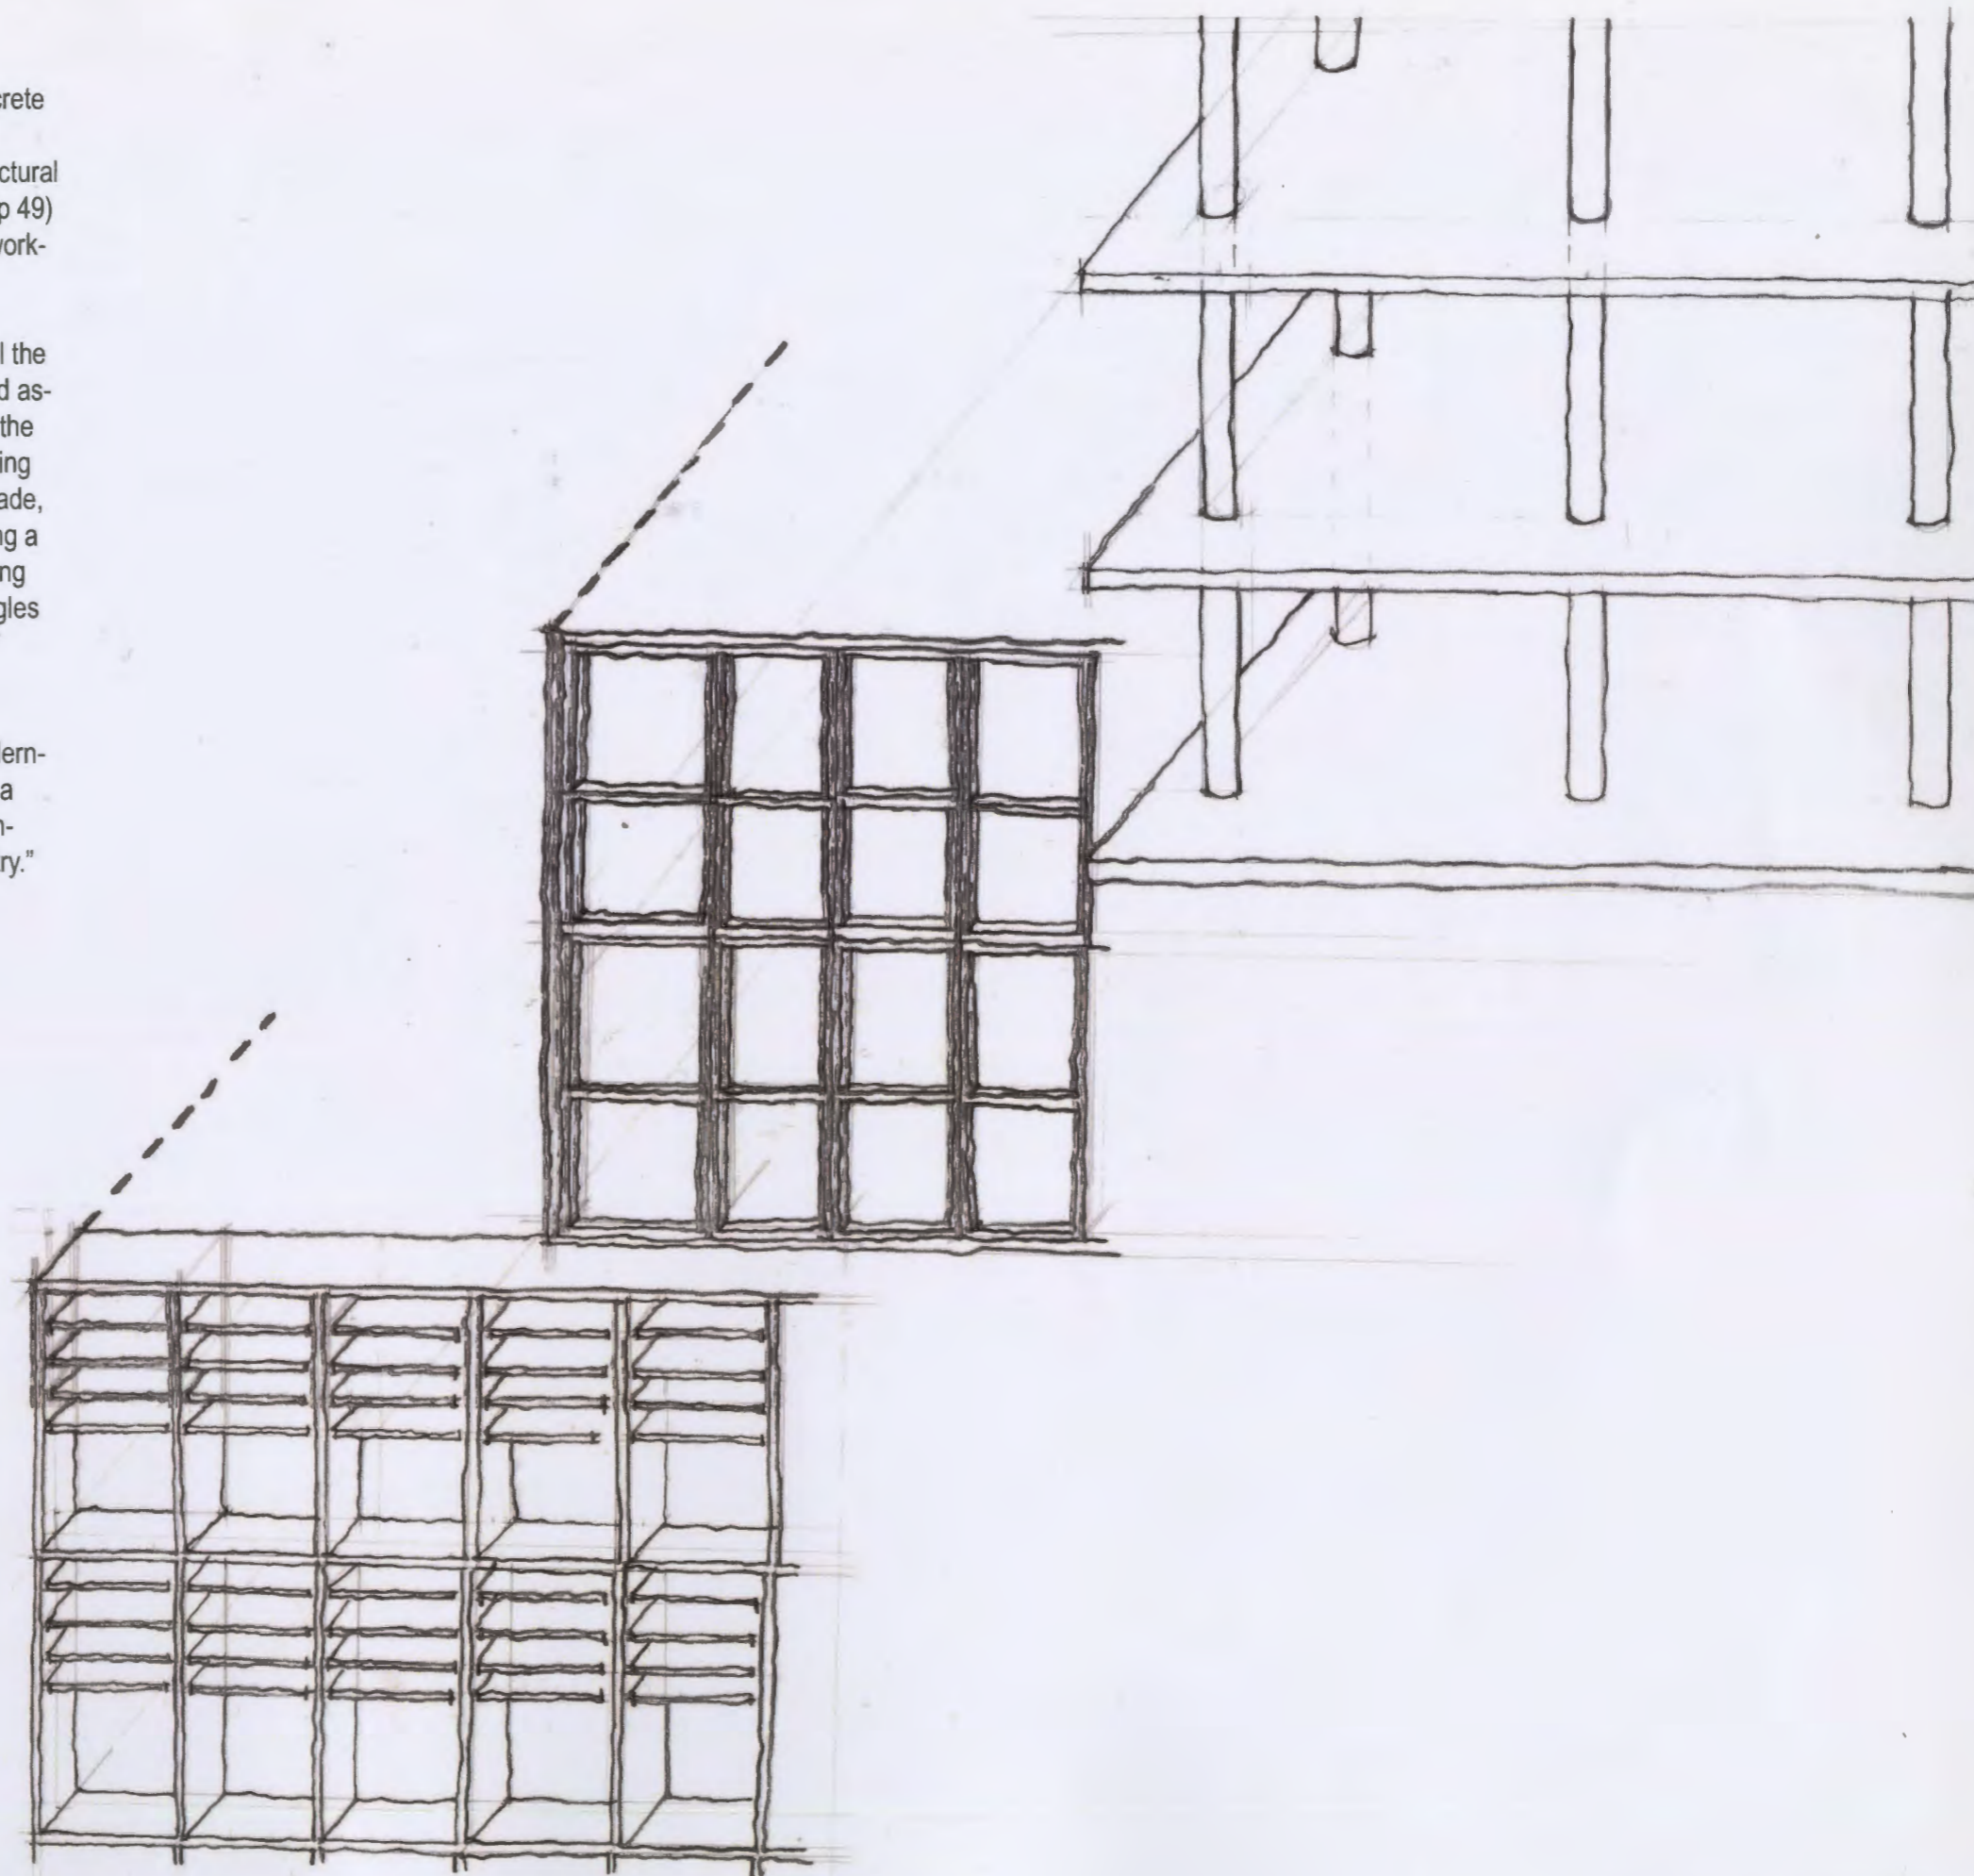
axonometric sketch showing the layering of the North facade scale 1:100
